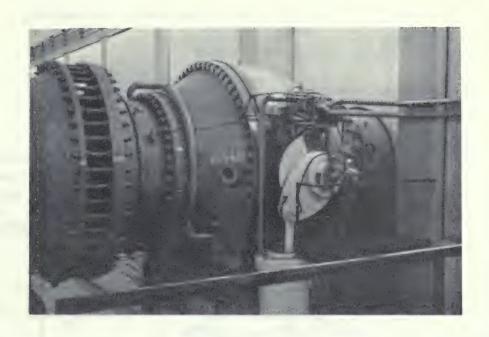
Expansion Joint and Turbine Inlet Valve
